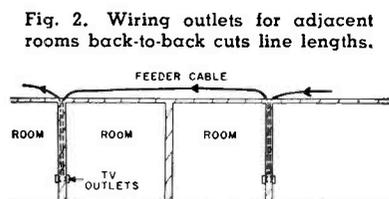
Wiring outlets for adjacent rooms back-to-back cuts line lengths.
